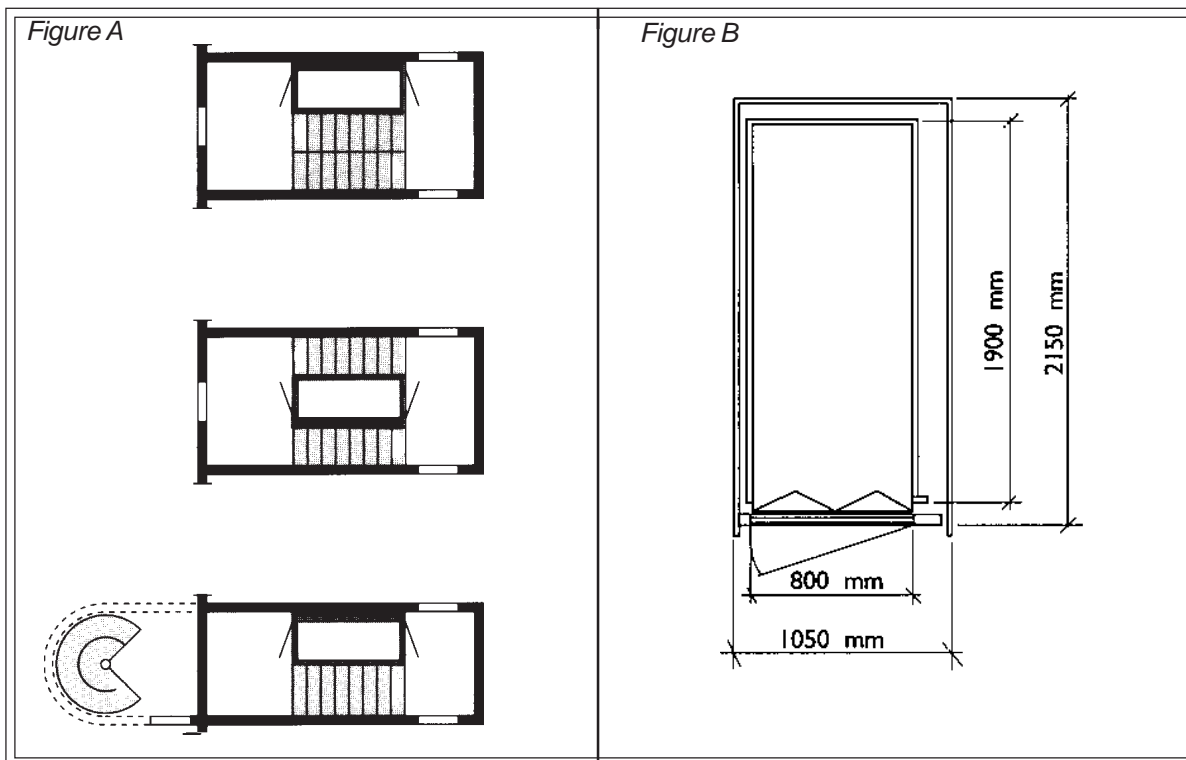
Figure A: A lift can be installed in a two-sided stairwell either in the middle of the stair flight or to one side of the stairs. Other solutions would be to build a new stairwell outside the frame of the building, or to place the lift outside the frame. Figure B: The measures of a narrow lift.
